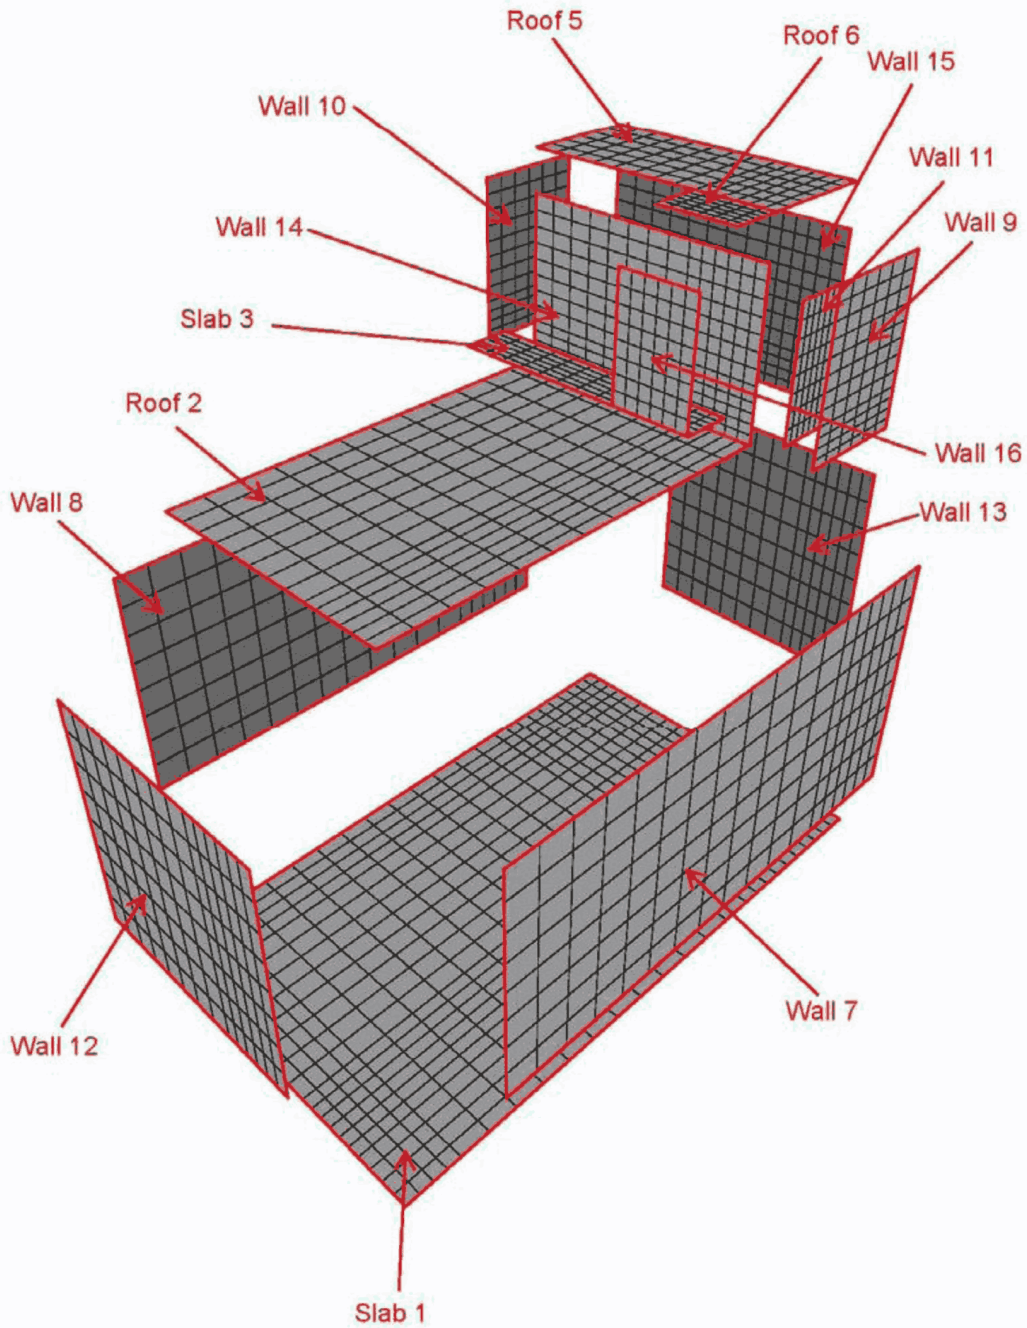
H.6-141 DGFOSV Wall and Slab Labeling Convention
